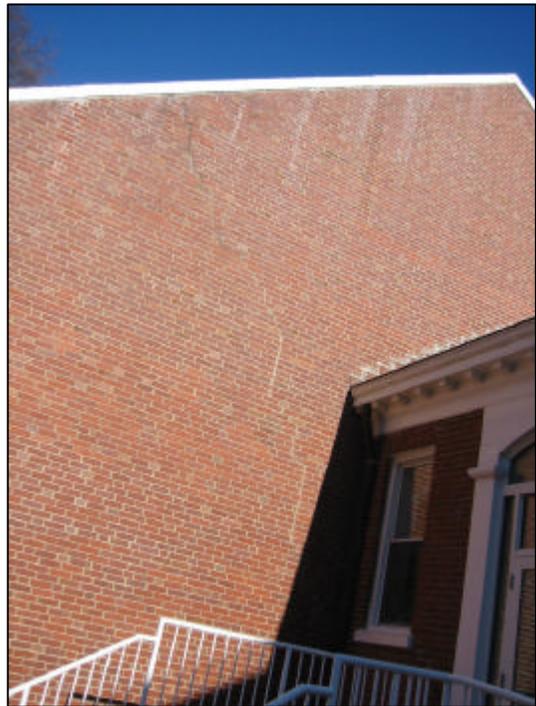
Exterior Masonry Settlement Cracking. Original Building South Wall
